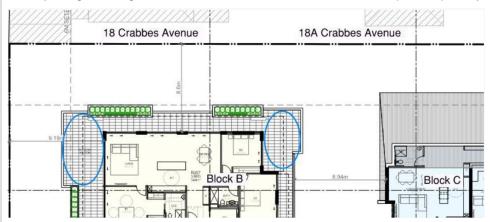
Extract of Level 3 showing main balcony areas oriented north and south away from adjoining dwellings (Source: Hyecorp/Amglen)
